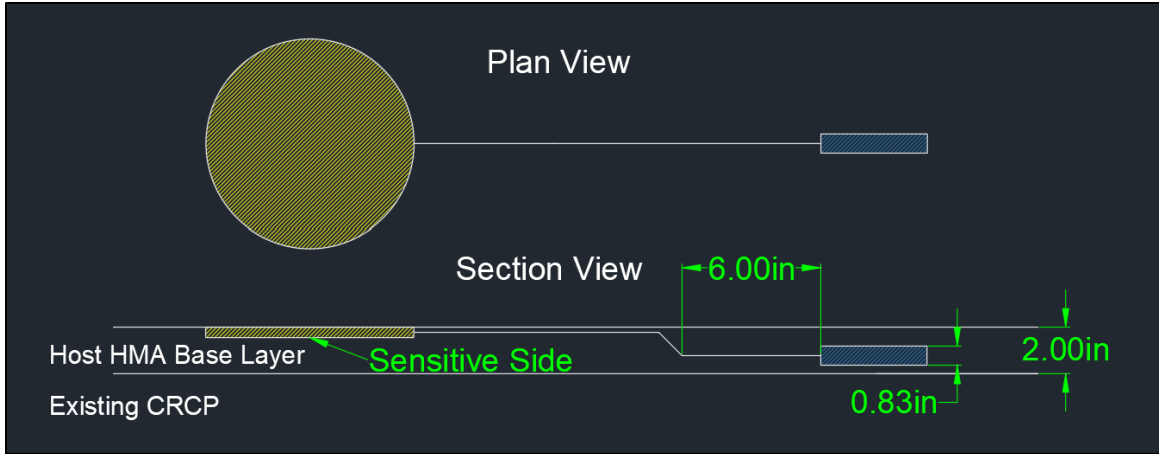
Photo. Stem bend drawing provided to the manufacturer.
